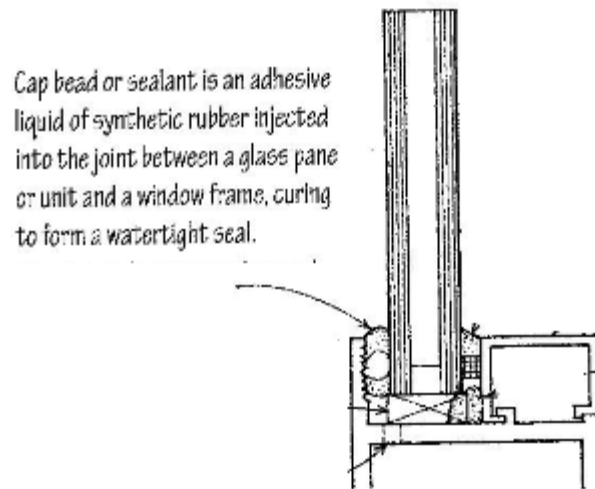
Glass veneer with wet glazing (Ching, 2008)
